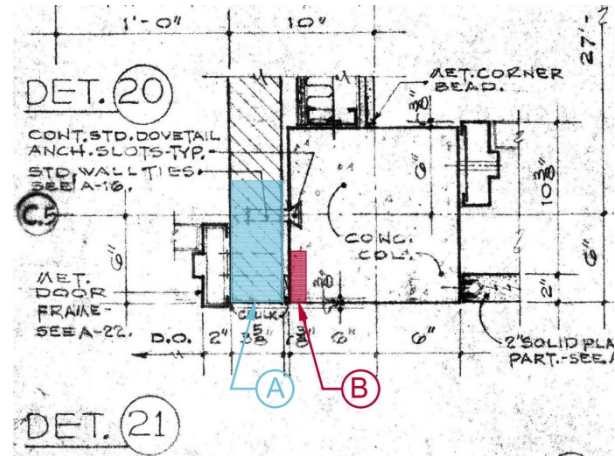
A = brick to be removed and replaced; B = concrete to be scarified and parged. [From 1968 Drawing A-18]
